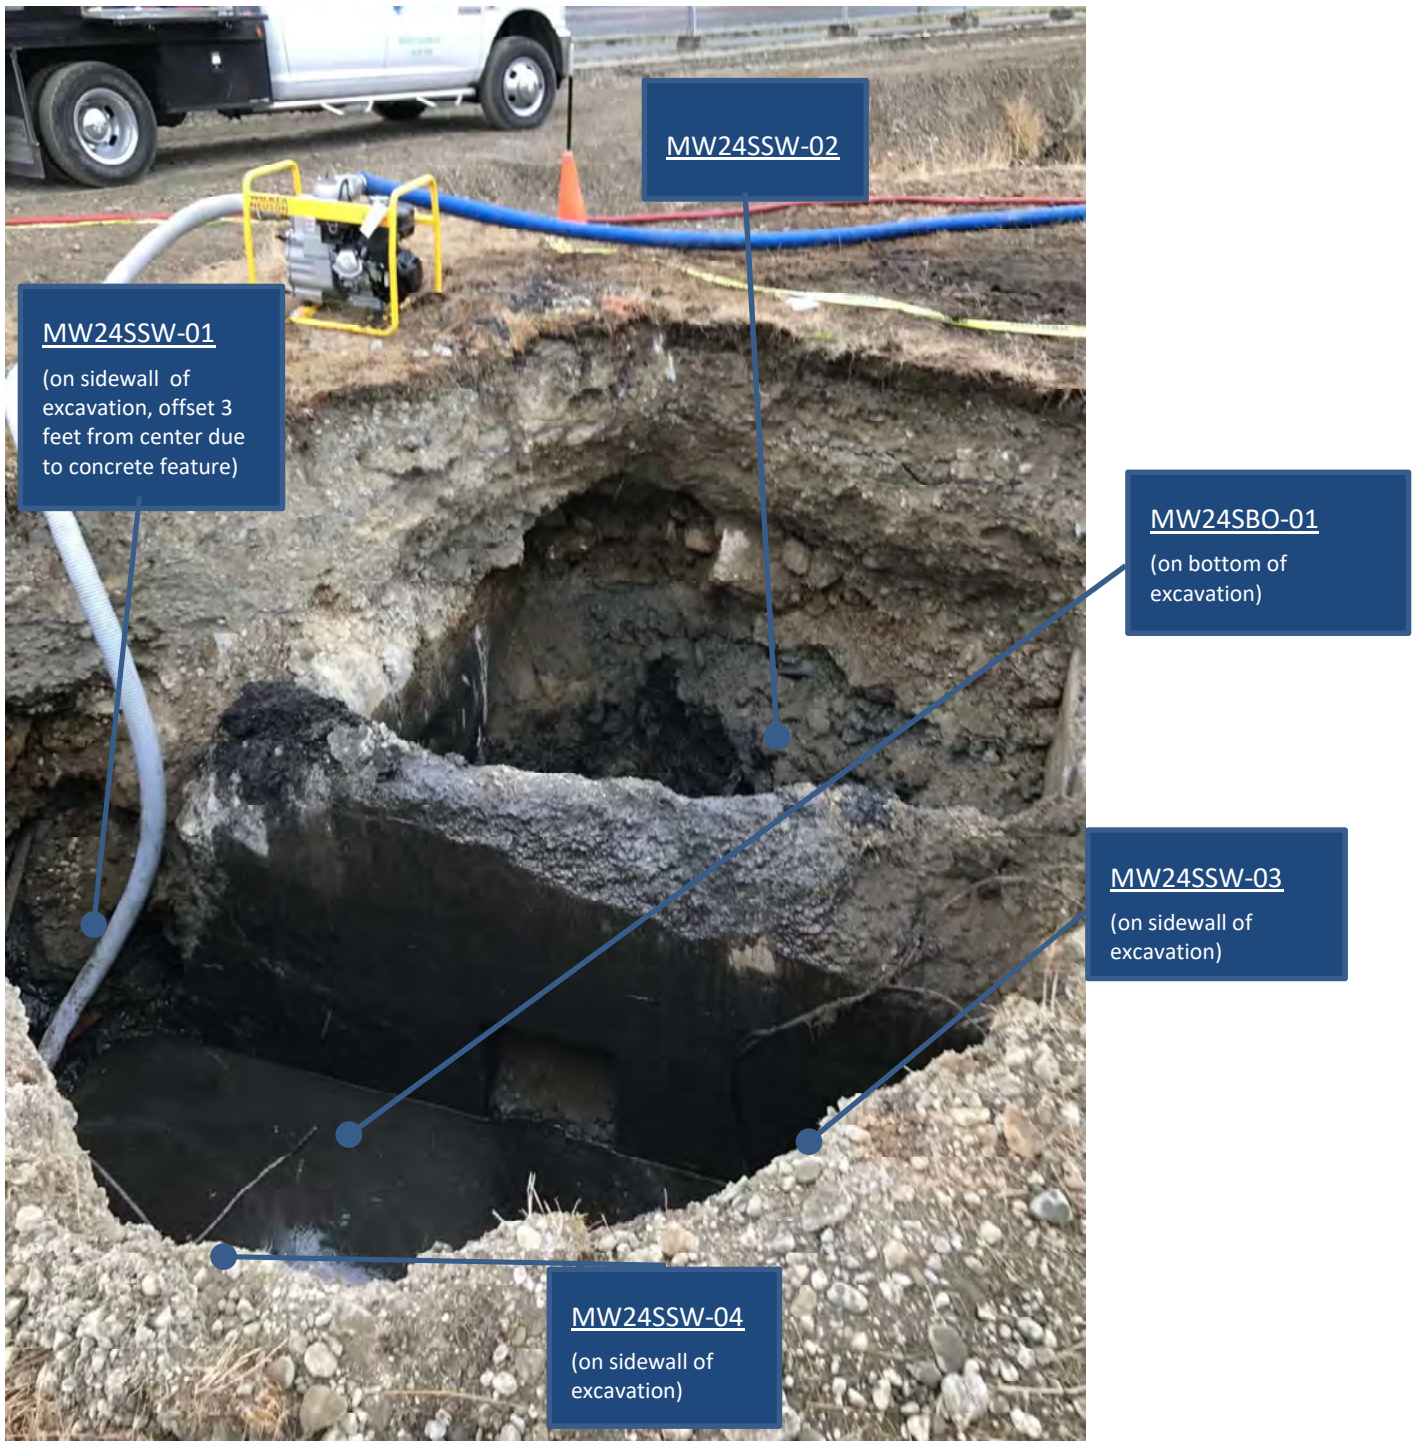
Surgical Excavation DP04 – Round 01 Excavation (looking to the east)
